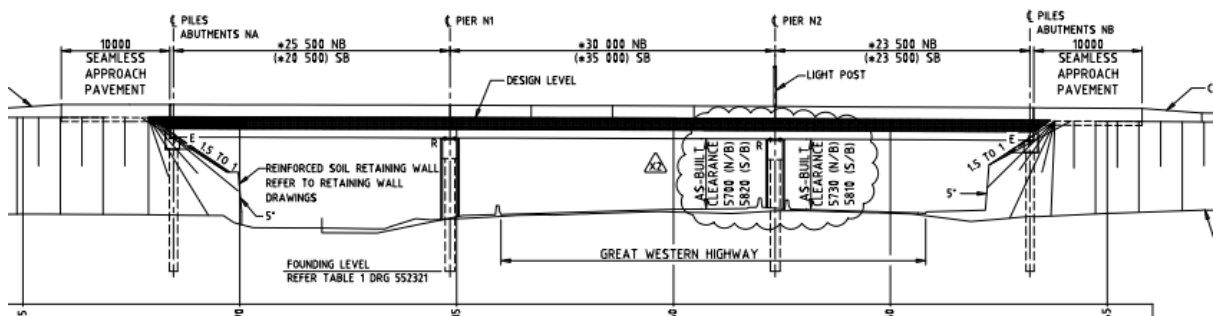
Elevation – Existing Super-T Girder Bridges with RSW abutments (shown for Infra 27.0)
